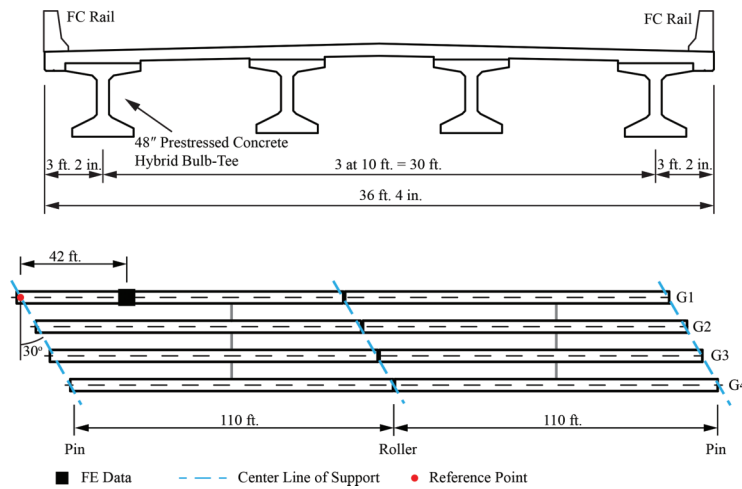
Cross-section and frame plan of the two-span continuous prestress girder bridge with 30-degree skew angle.
